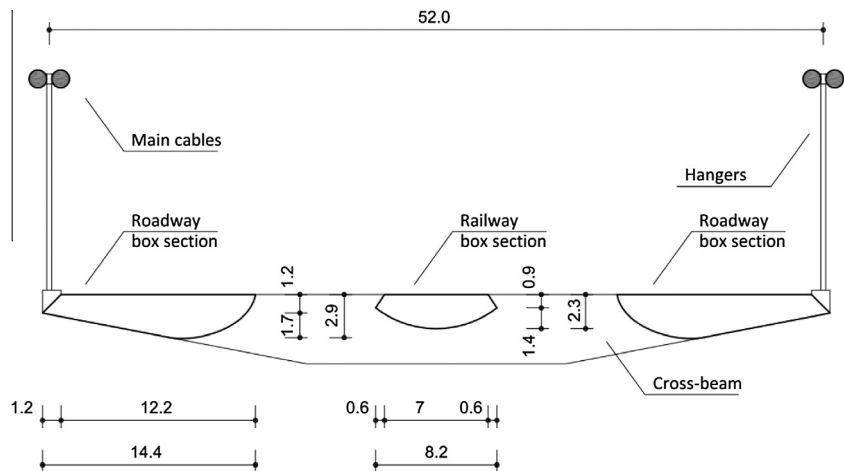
Geometrical dimensions of the bridge-deck section (m).
